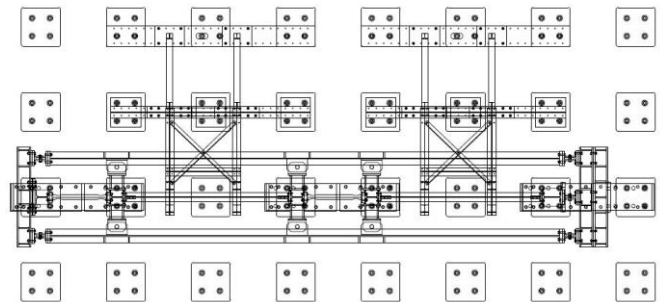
Experimental test set-up for test on DRD2 frame - Plan view
